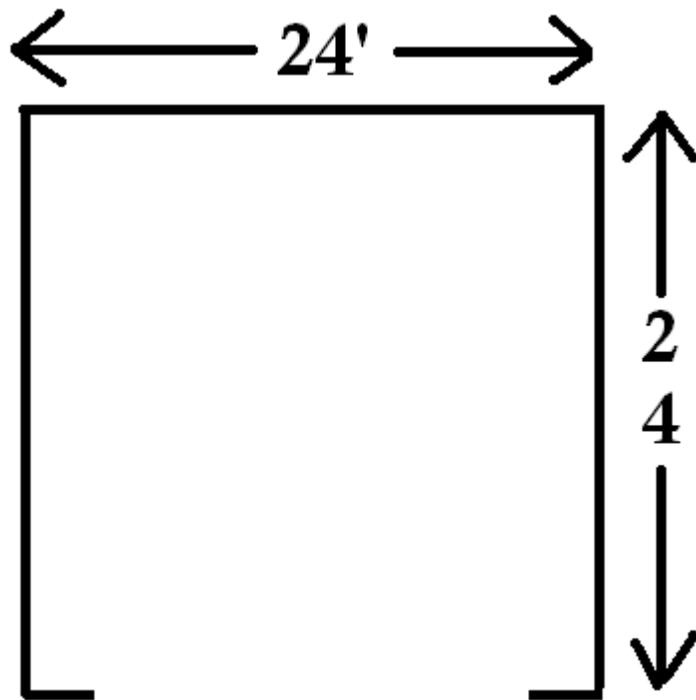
Fort Sumner Lithium Battery Storage (Building R3) Floor Plan
